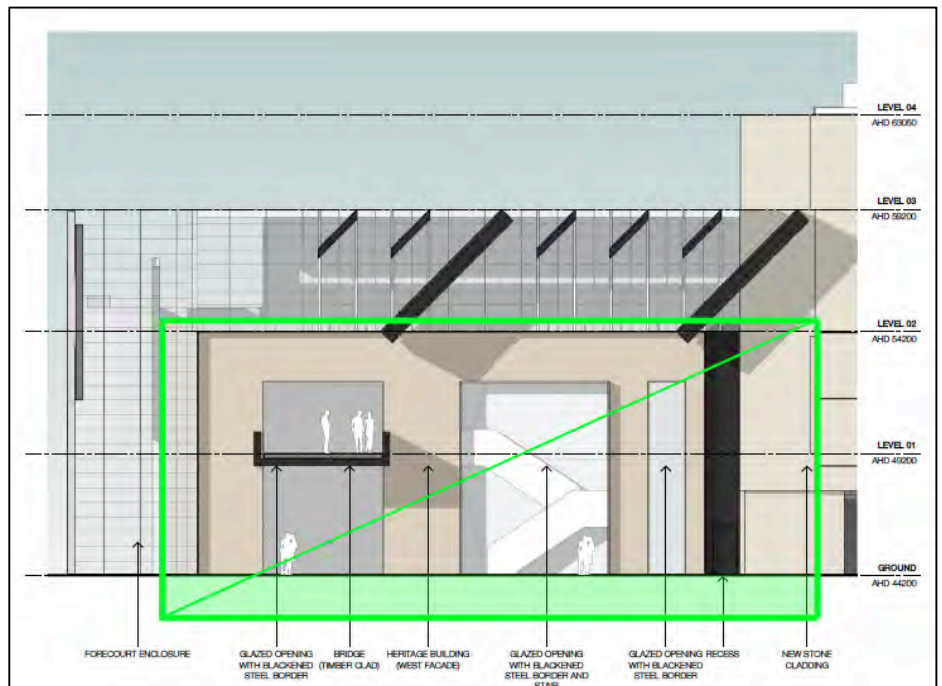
Image of proposed treatment of Western wall of heritage building (Woods Bagot) with annotation added by author (green lines showing approximate extent of existing wall, and shading where it is below ground level).
